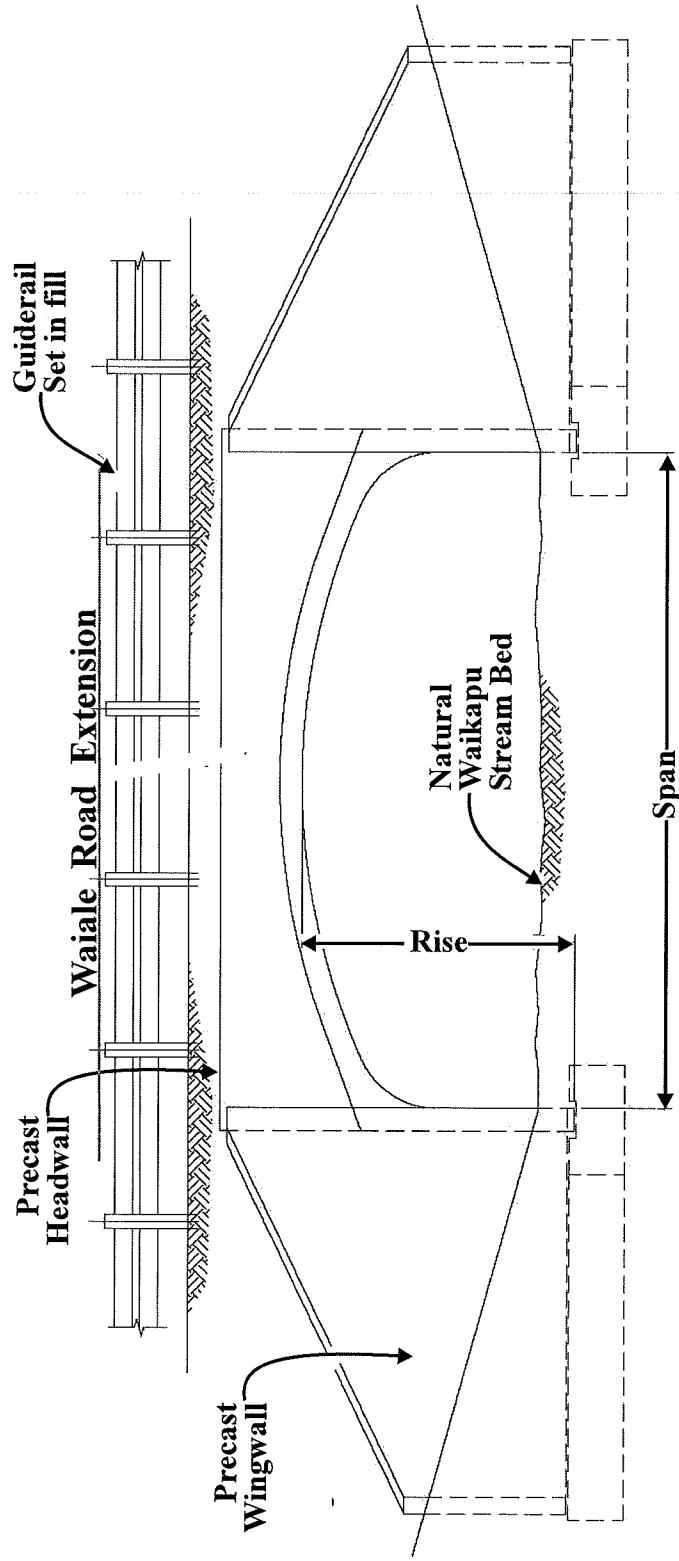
Proposed Waiale Road Extension and East Waiko Road Improvements
